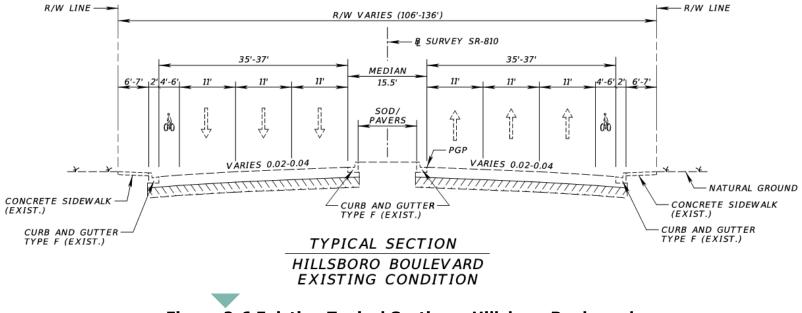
Existing Typical Section – Hillsboro Boulevard
